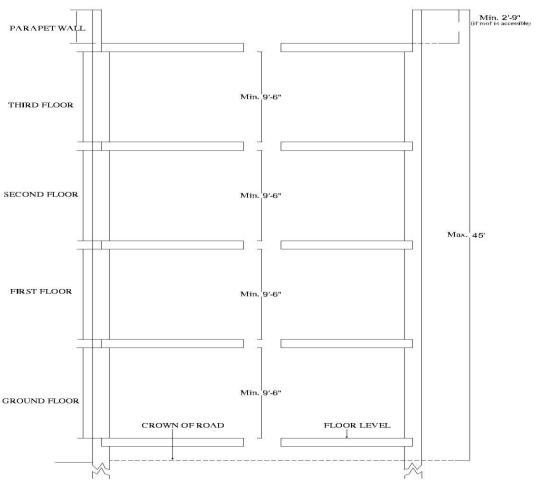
(a)ii Height of Residential Building above 25 ft wide roads
